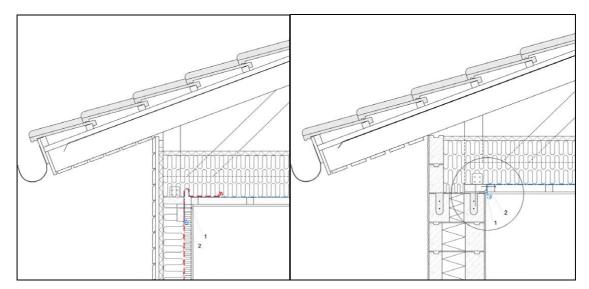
Examples of airtight junctions between a wood-framed roof structure and external wall.
